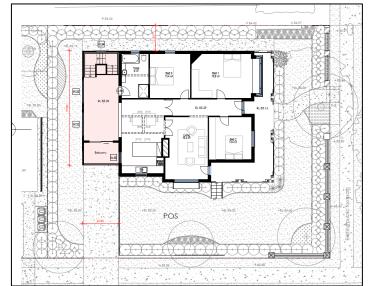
Proposed ground floor plan of existing dwelling (heritage item)
